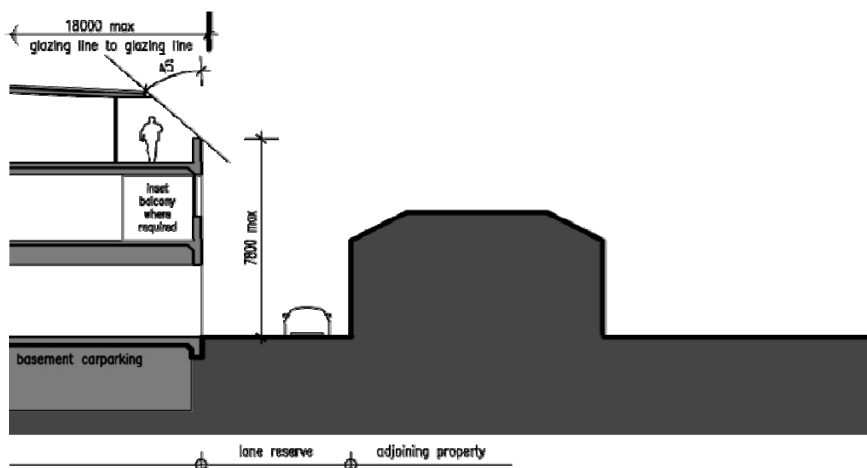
Waverley Development Control Plan 2012 - Annexure E 3-1 - examples of typical built form envelopes - Building depth and other controls at the rear boundary over laneway.
